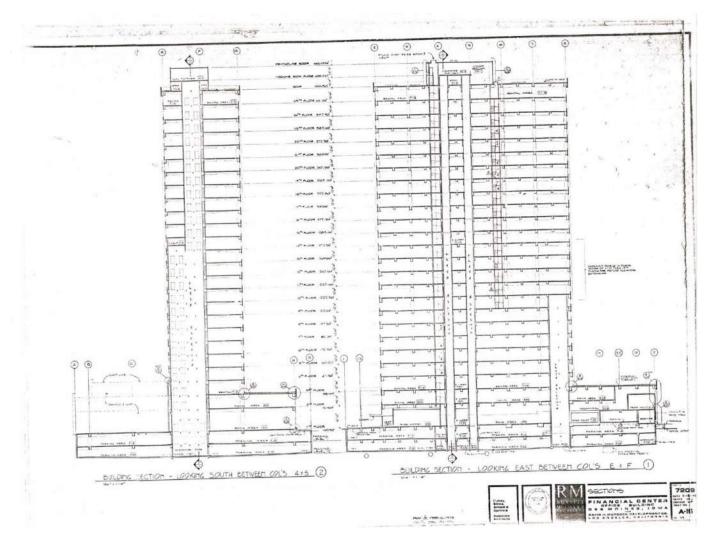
Historic drawings of Financial Center building sections looking south and east, revision dated February 1973. (Financial Center Office Building drawings, Russell McCaleb, architect, Guirey, Srnka, Arnold & Sprinkler associated architects).
